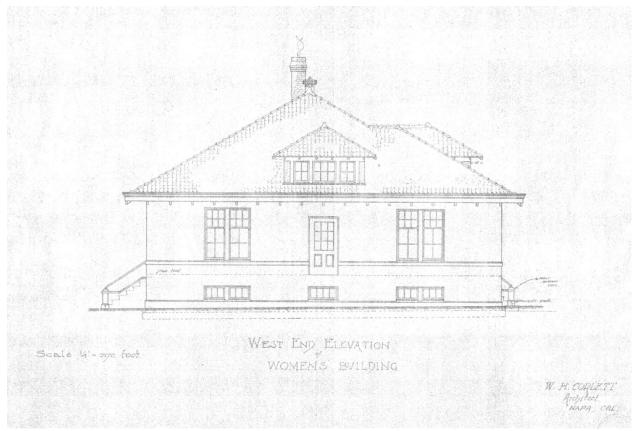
Building C, West Elevation William H. Corlett, 1912.
